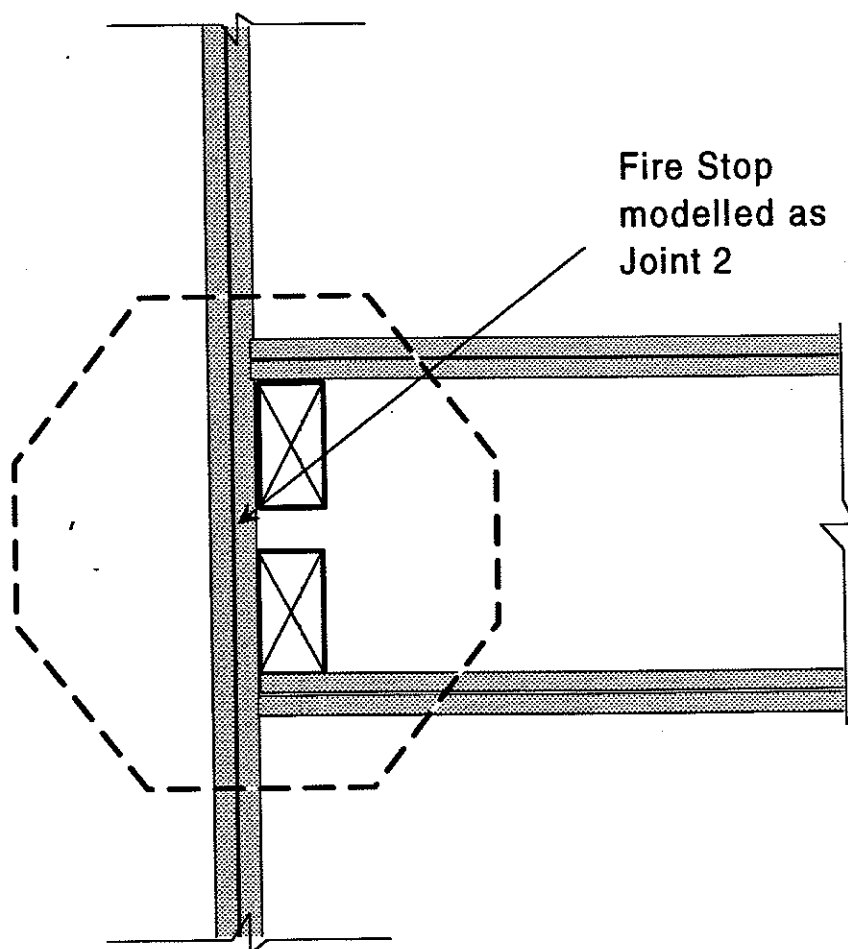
Sketch showing the fire stop in the flanking wall which was modelled as Joint 2.
